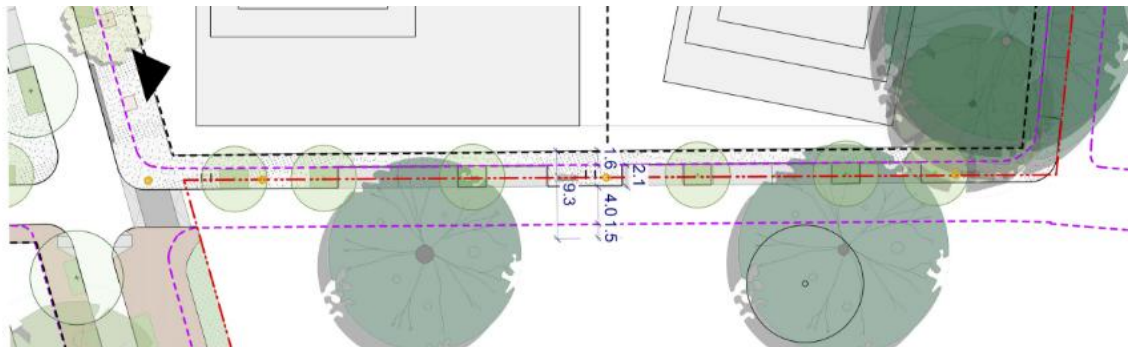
Street Plan - Kellick Street (Aspect Studios)
